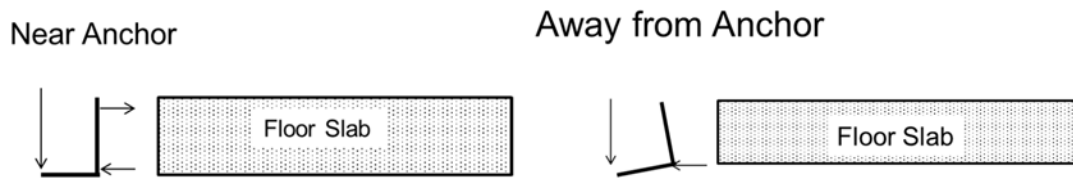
Action of the Steel Shelf Angle at Anchors and Away from Anchors
